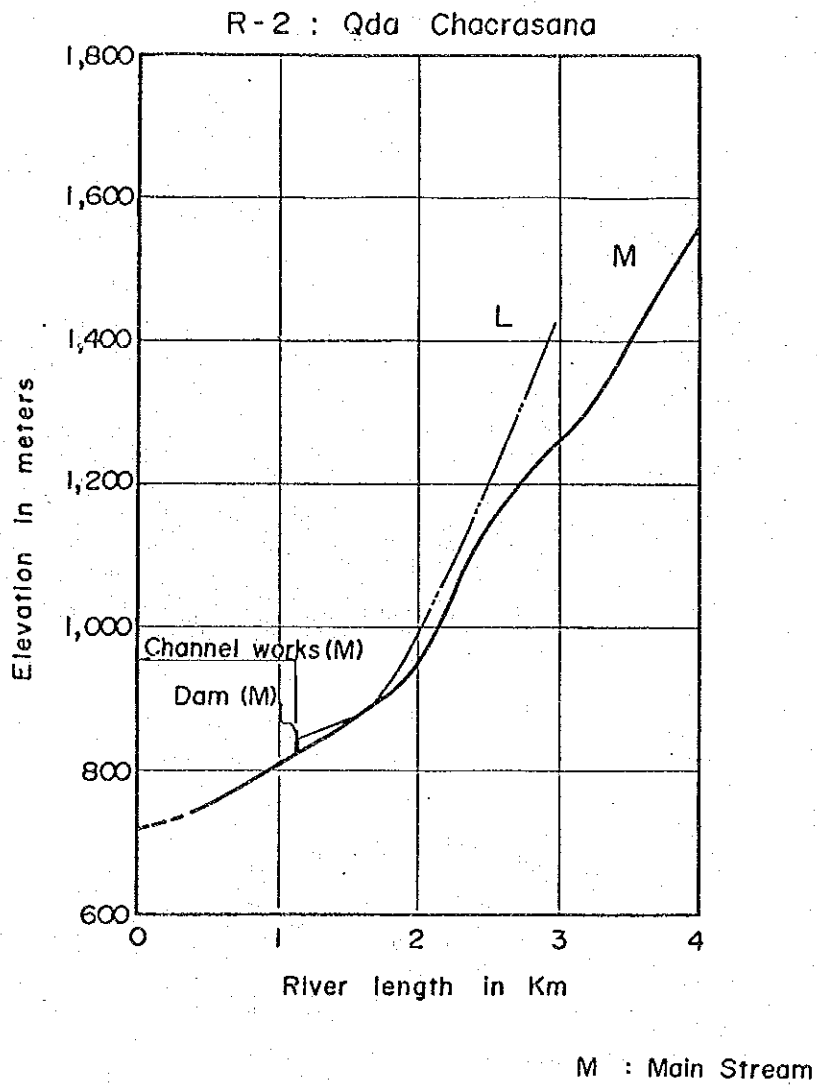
Structural Plan on Profile of Qda Chacrasana (R2)
